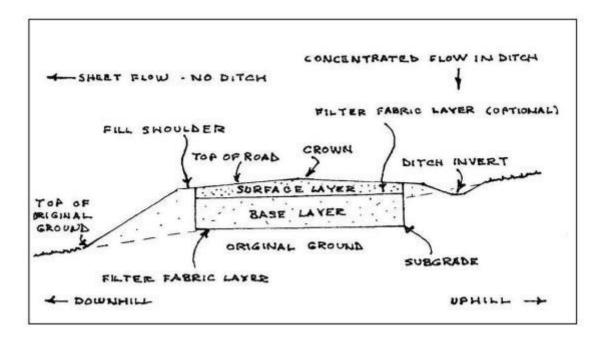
Typical Road Cross-Section – Canaan, NH Highway Department
